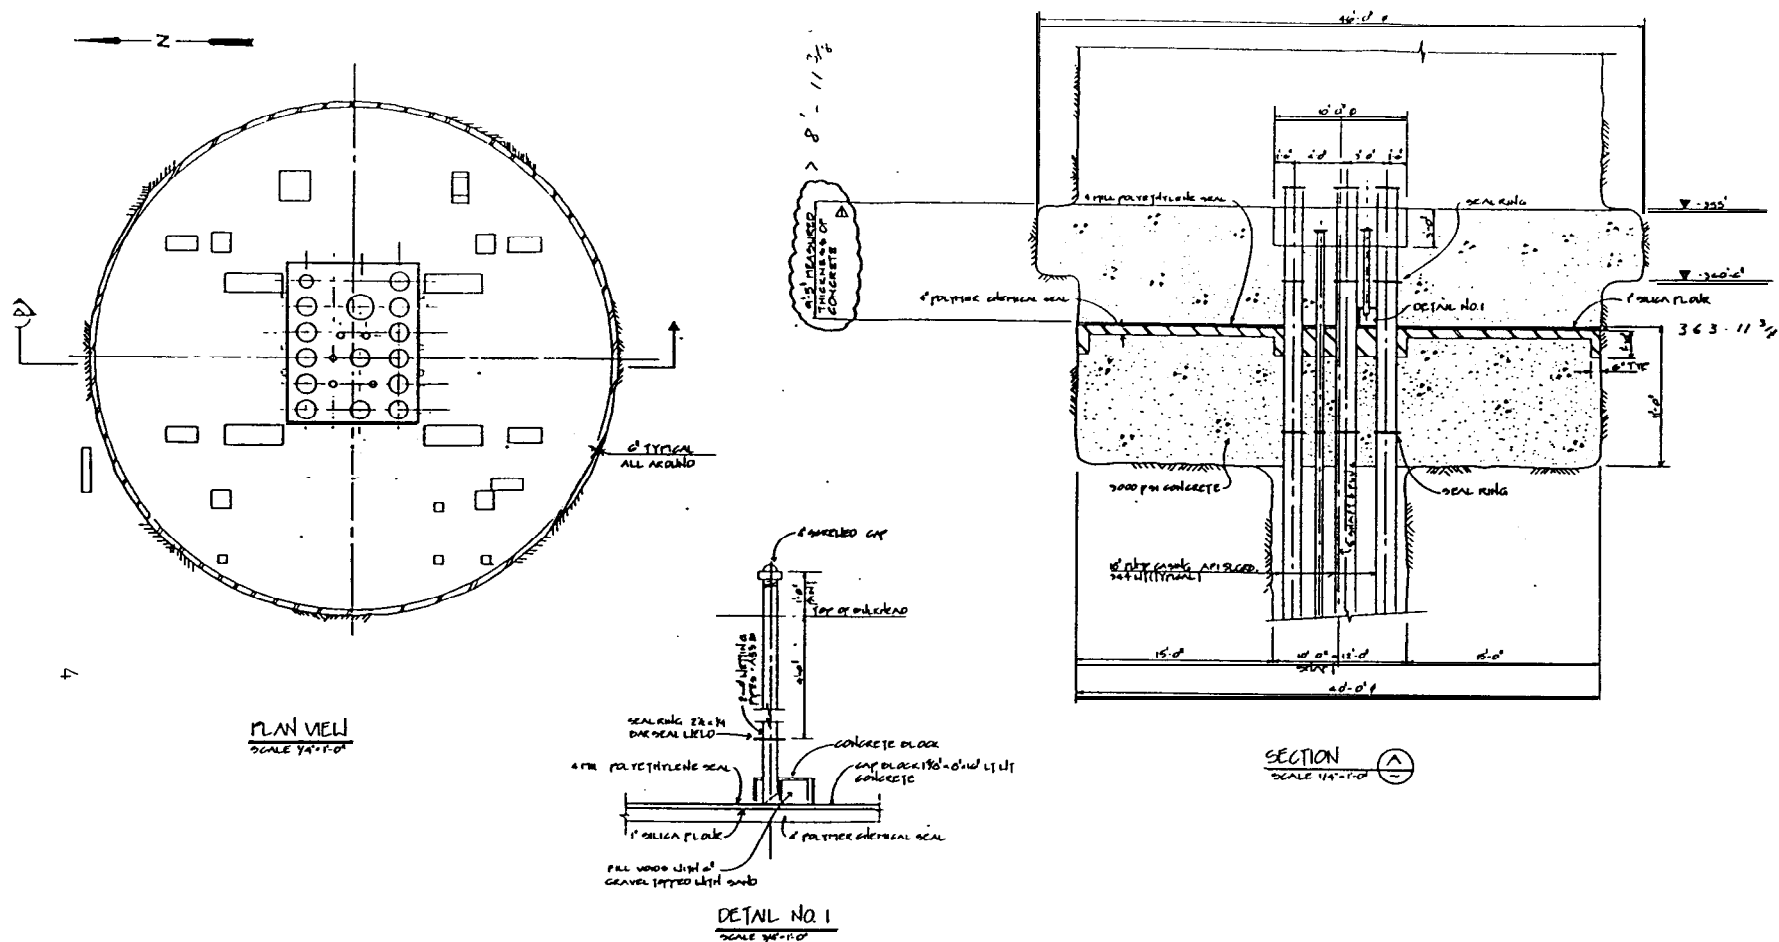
As-Built Drawing of Service Shaft Bulkhead.
